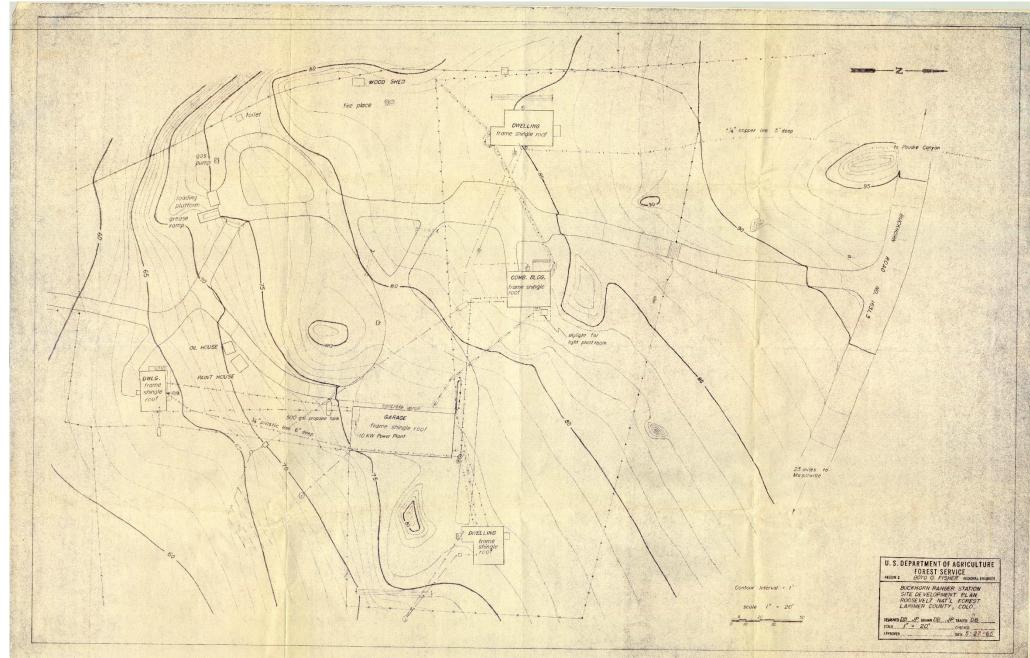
"Buckhorn Ranger Station Site Development Plan" 5/27/1965.
